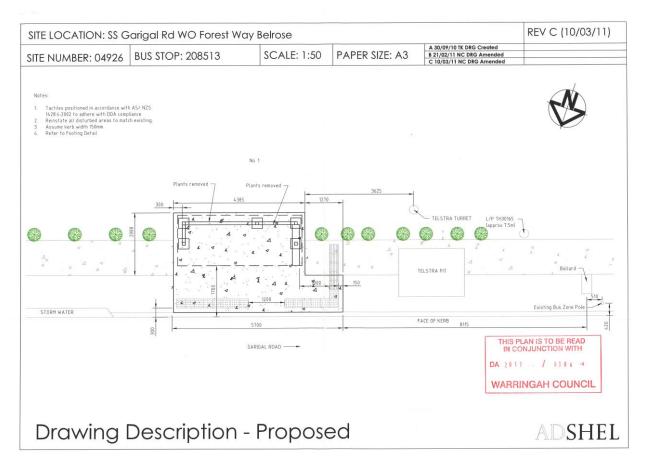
Shelter G1 DA2011/0384 Stamped Site Plan
